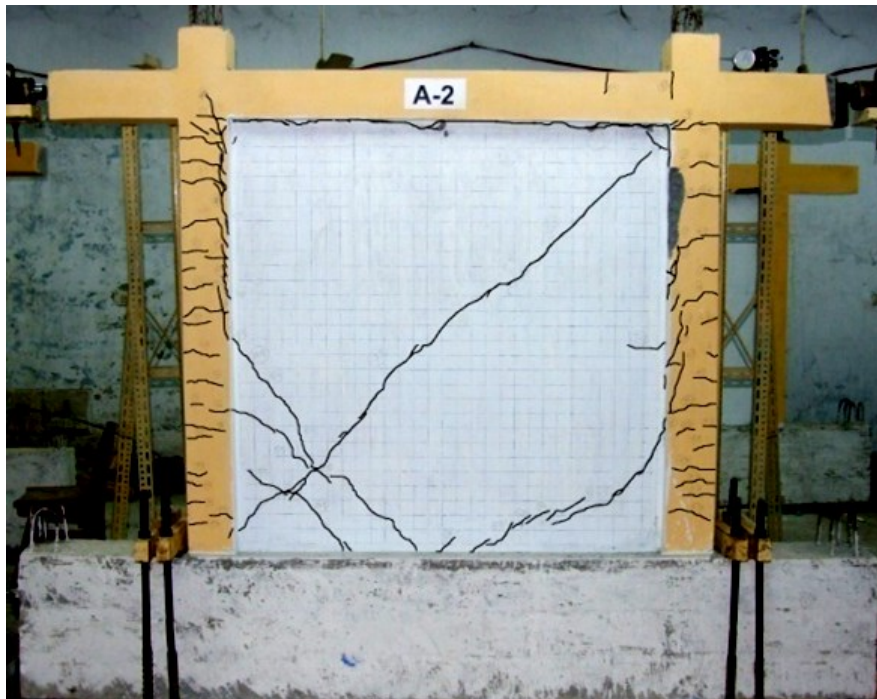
(b) Crack patterns at maximum lateral load in brick infilled RC frame model specimen A2
